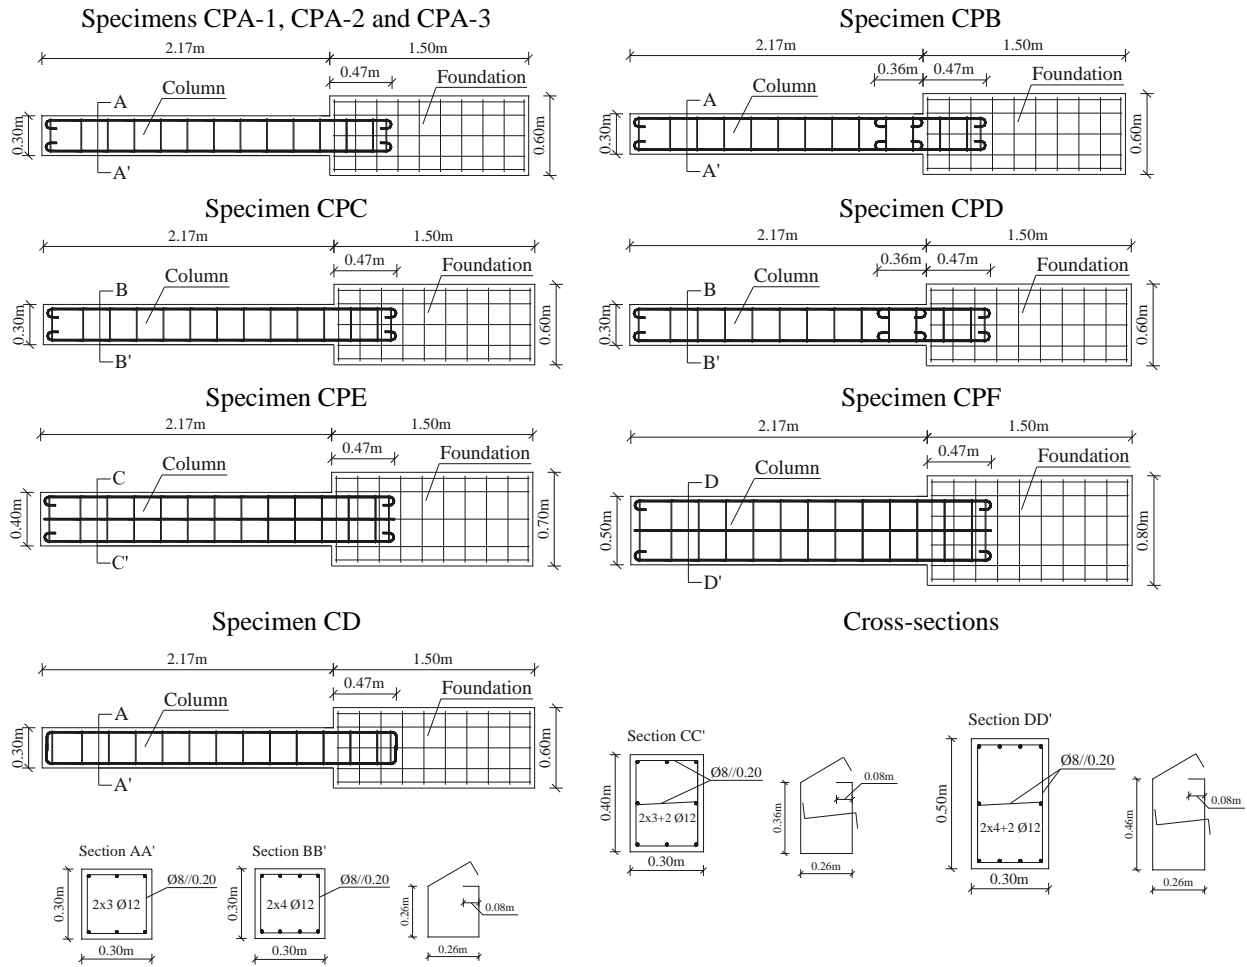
Geometry, dimensions and reinforcement detailing of the specimens.
